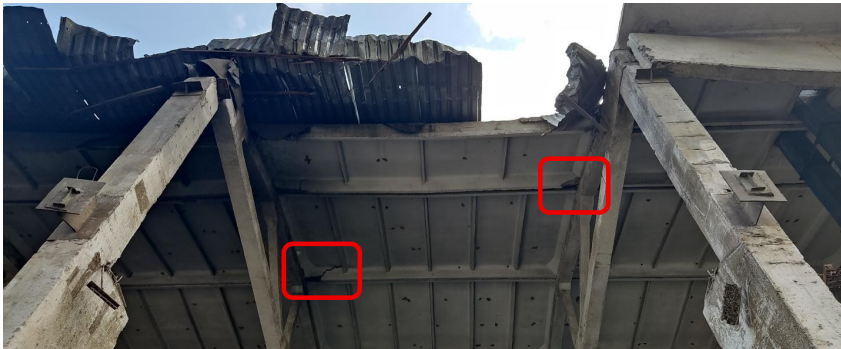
(a-b) – Collapse of crane beams and detachment of embedded parts of their attachment to columns
